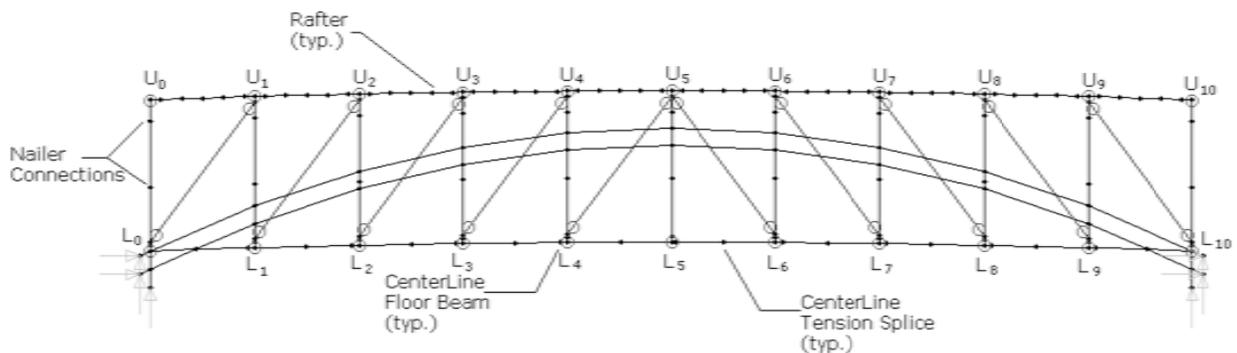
Gilpin's Falls Covered Bridge two-dimensional frame model (completed structure).
